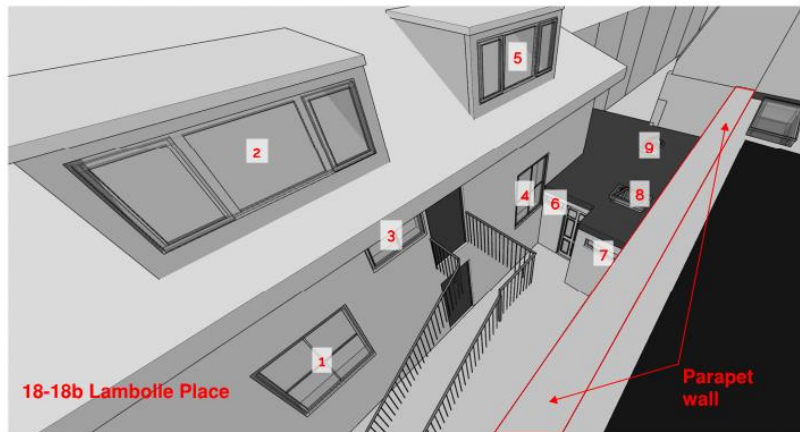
windows of 18-18b Lambolle Place identified in daylight /sunlight report
